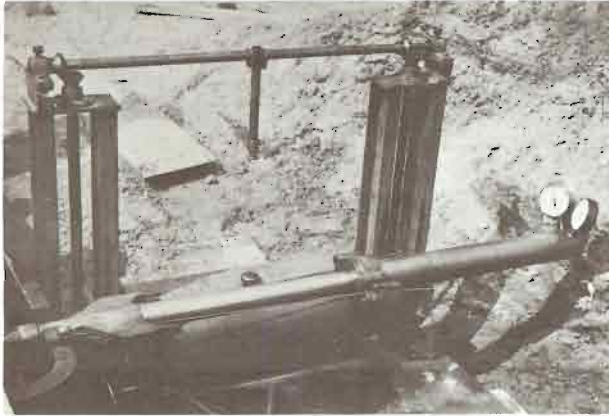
Hydraulic jack for tensioning and anchoring the wires
